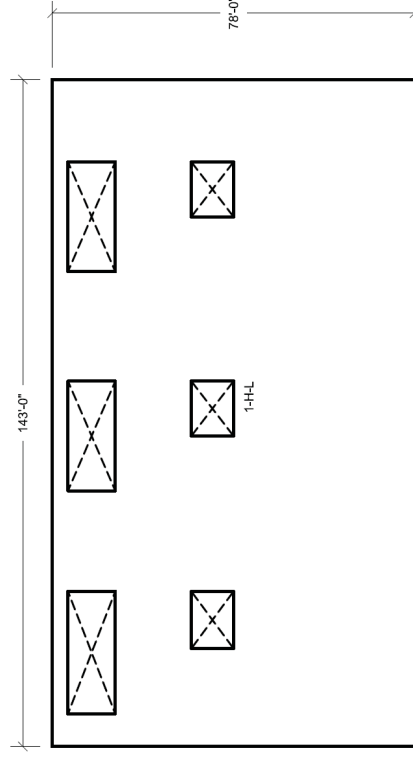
H.6-138B: PUMP HOUSE ROOF
